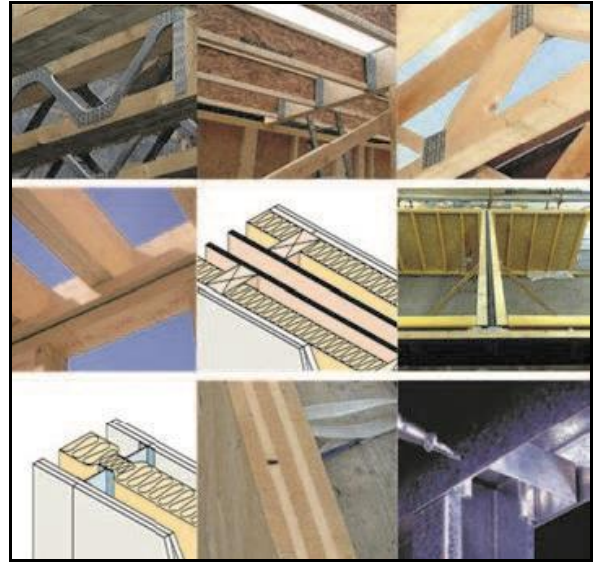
Examples of timber and lightweight frame wall and floor structures found in European countries, taken from [9].
